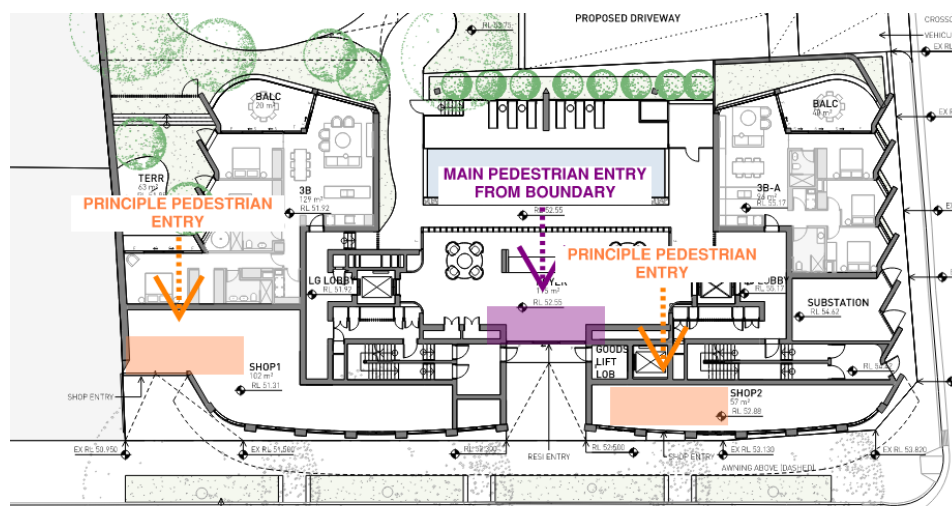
| Mark-up of the entrance doors required to be accessible [Source: Smart Studio Design architect]
